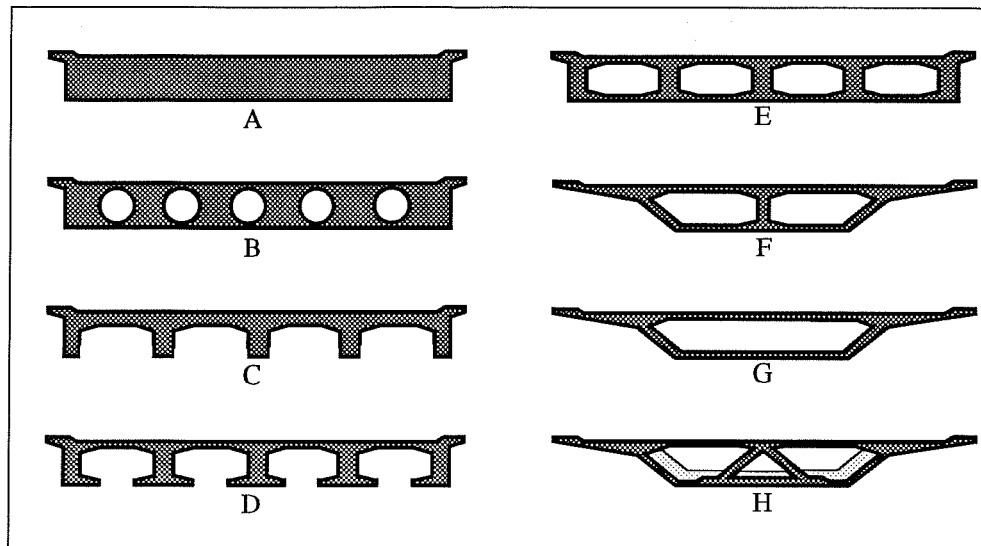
Evolution of concrete box girder segments (after Schlaich [10]).
